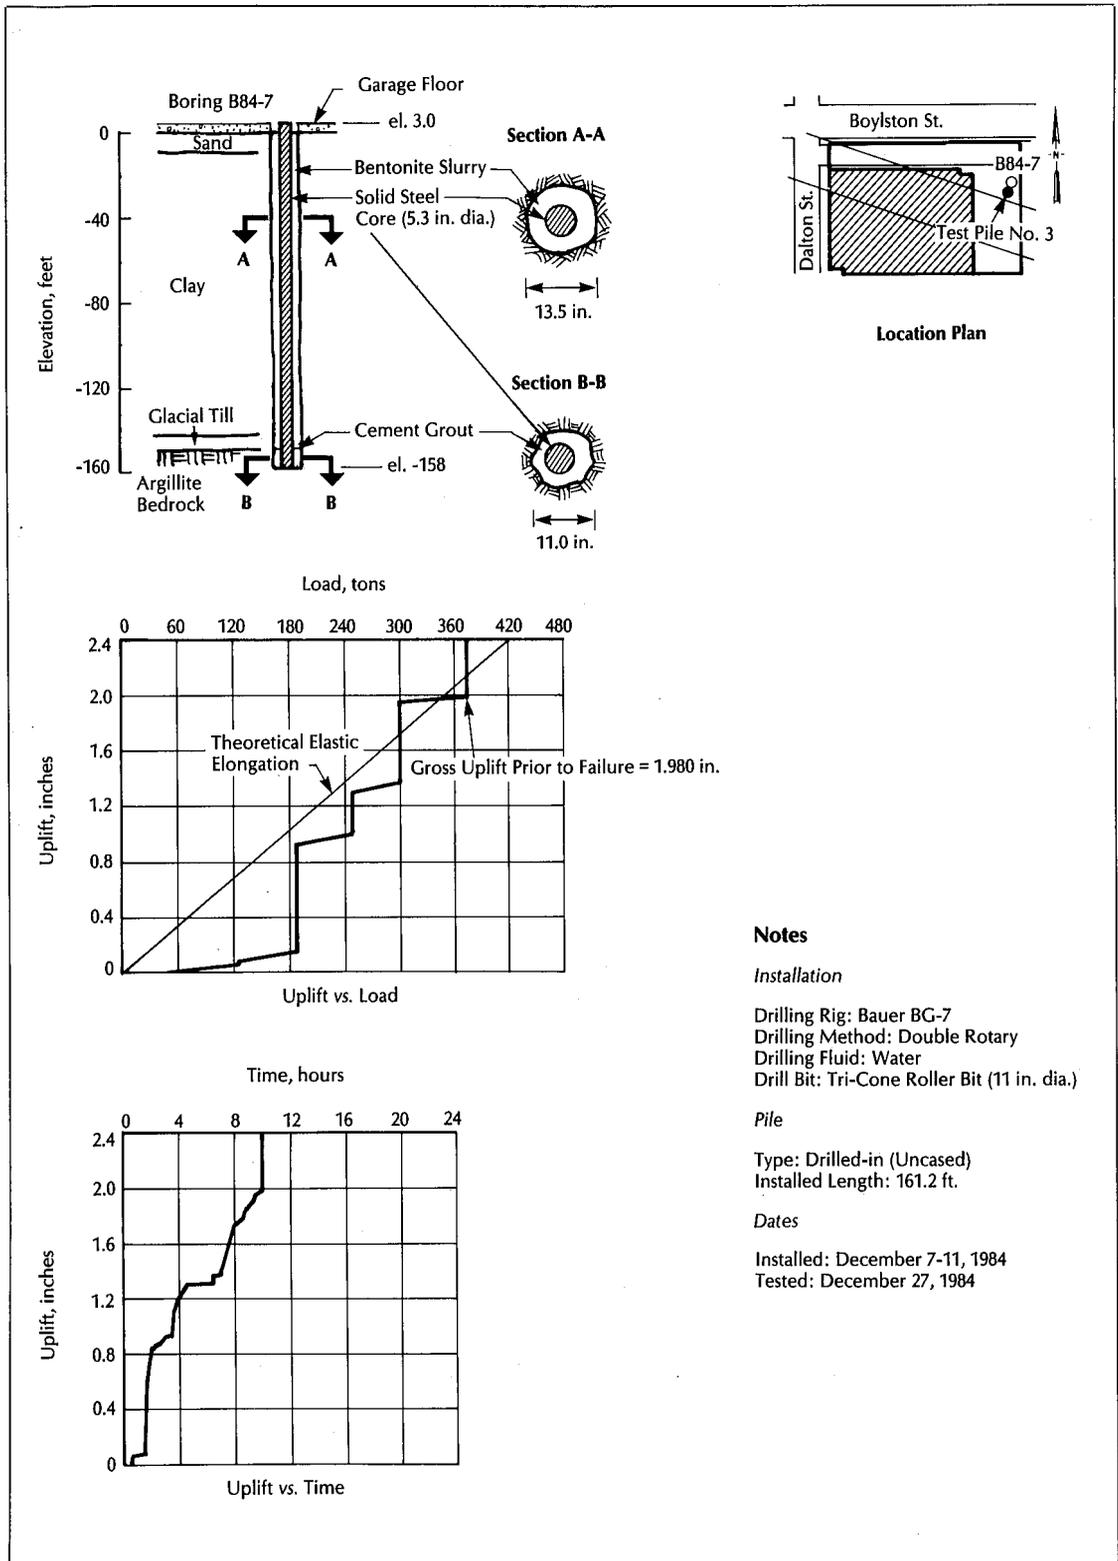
Results of the tension load test for Test Pile No. 3.
